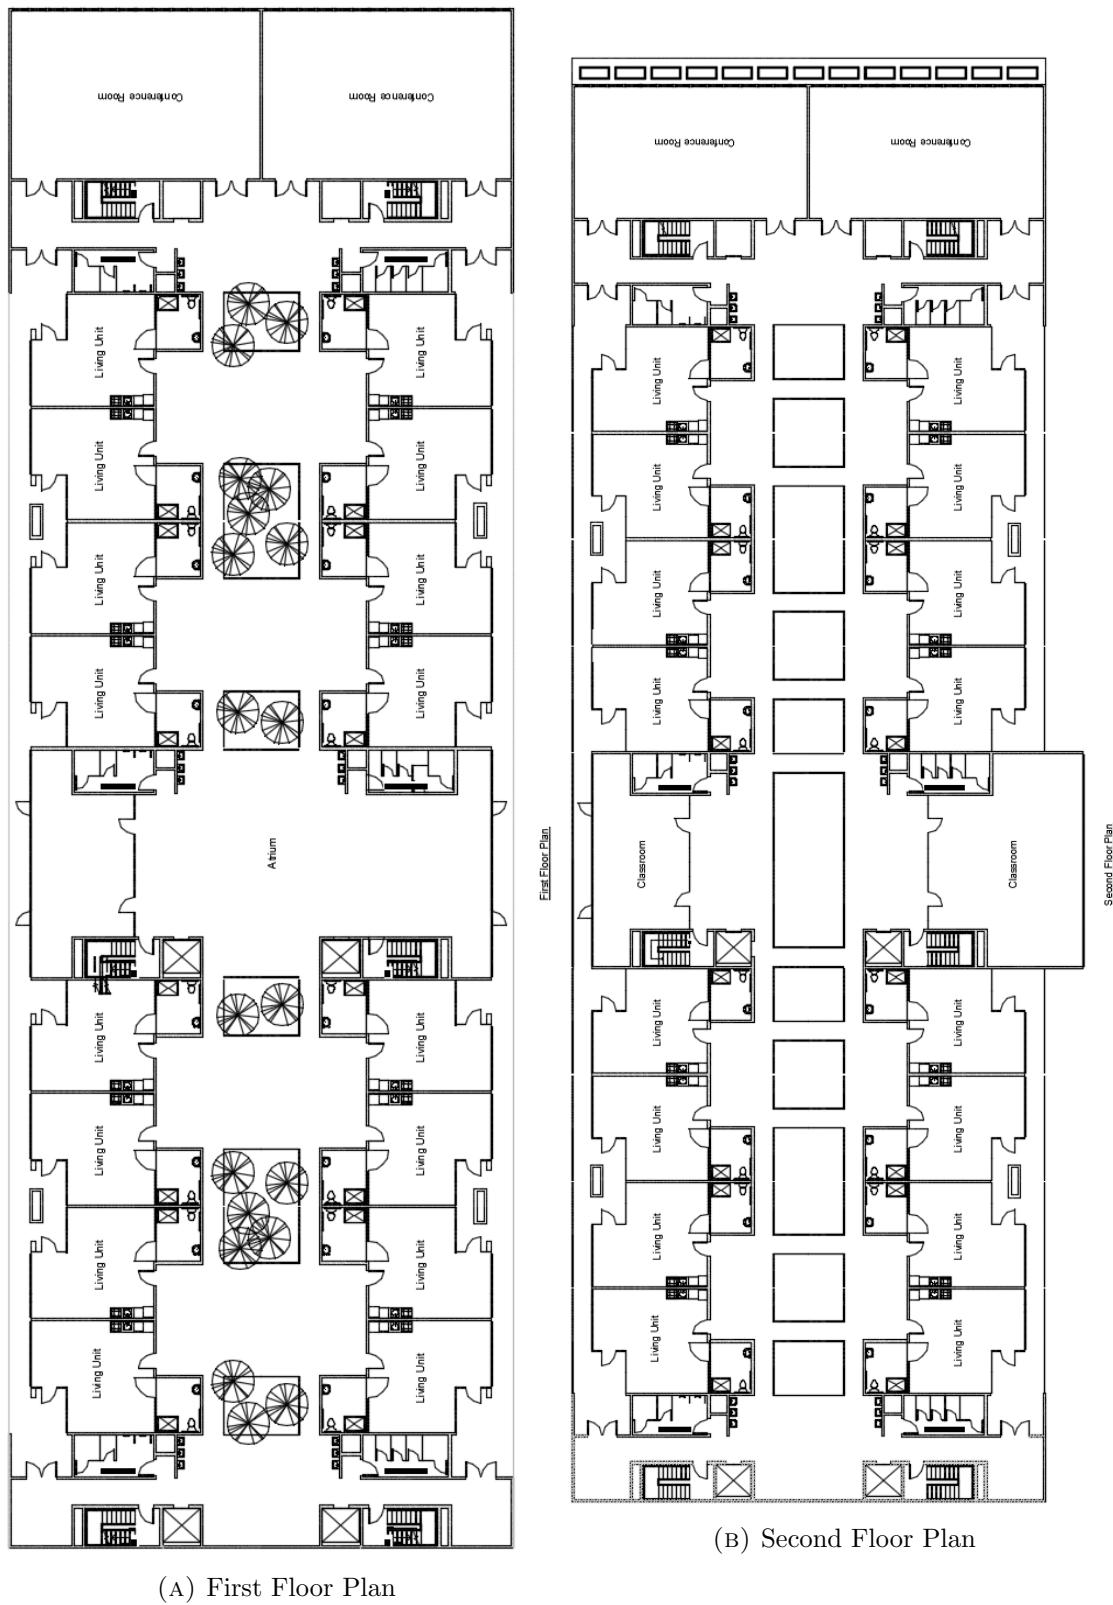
FloorPlan, First Floor and Second Floor
